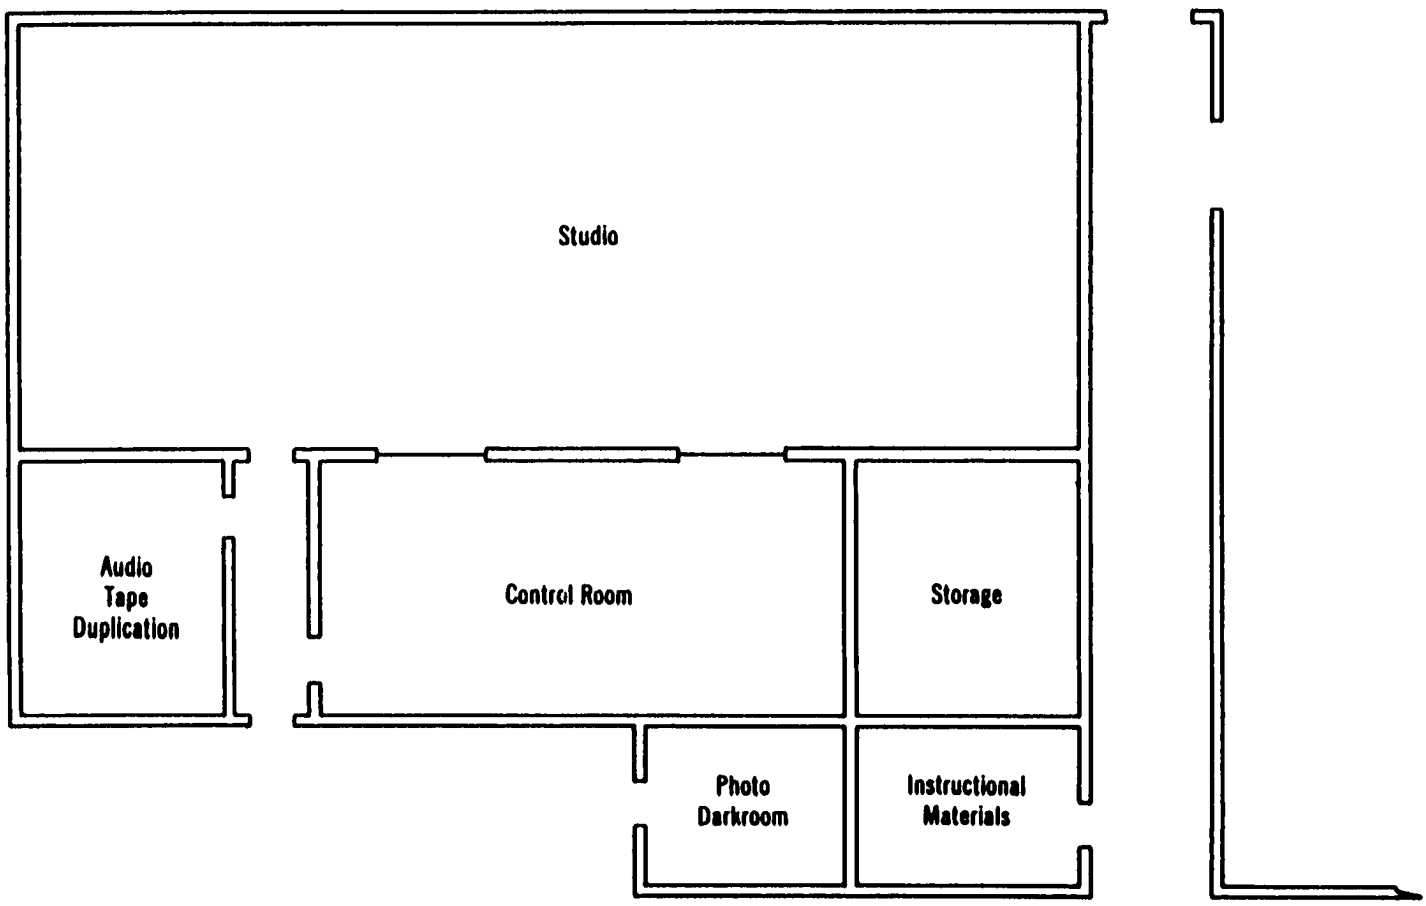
Floor plan of Kellogg Community College's television complex as housed in Instructional Resource Center.
